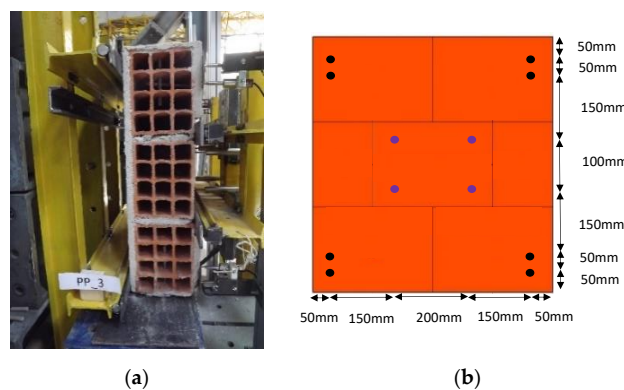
Flexural strength tests parallel to horizontal bed joints: (a) profile view of the test setup; and (b) schematic layout of the instrumentation (units in millimetres).
